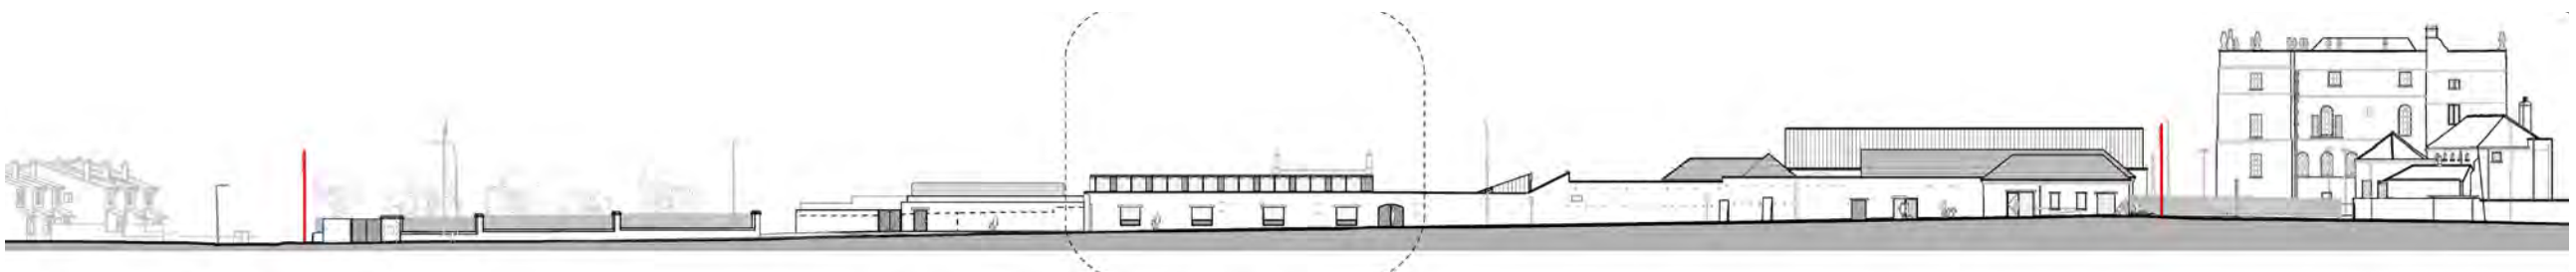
Site elevation from west indicating extent of new clerestory window within overall complex
